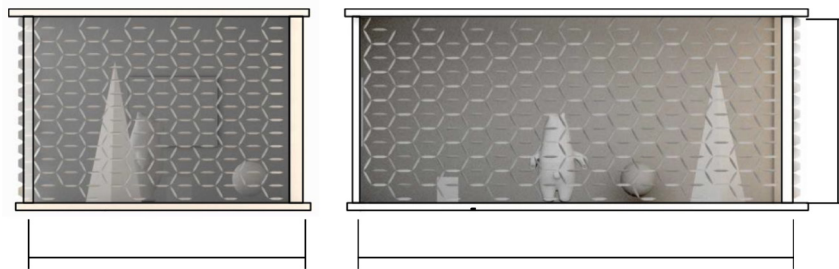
The front and sides of the experimental area installed with adaptive building façade.
